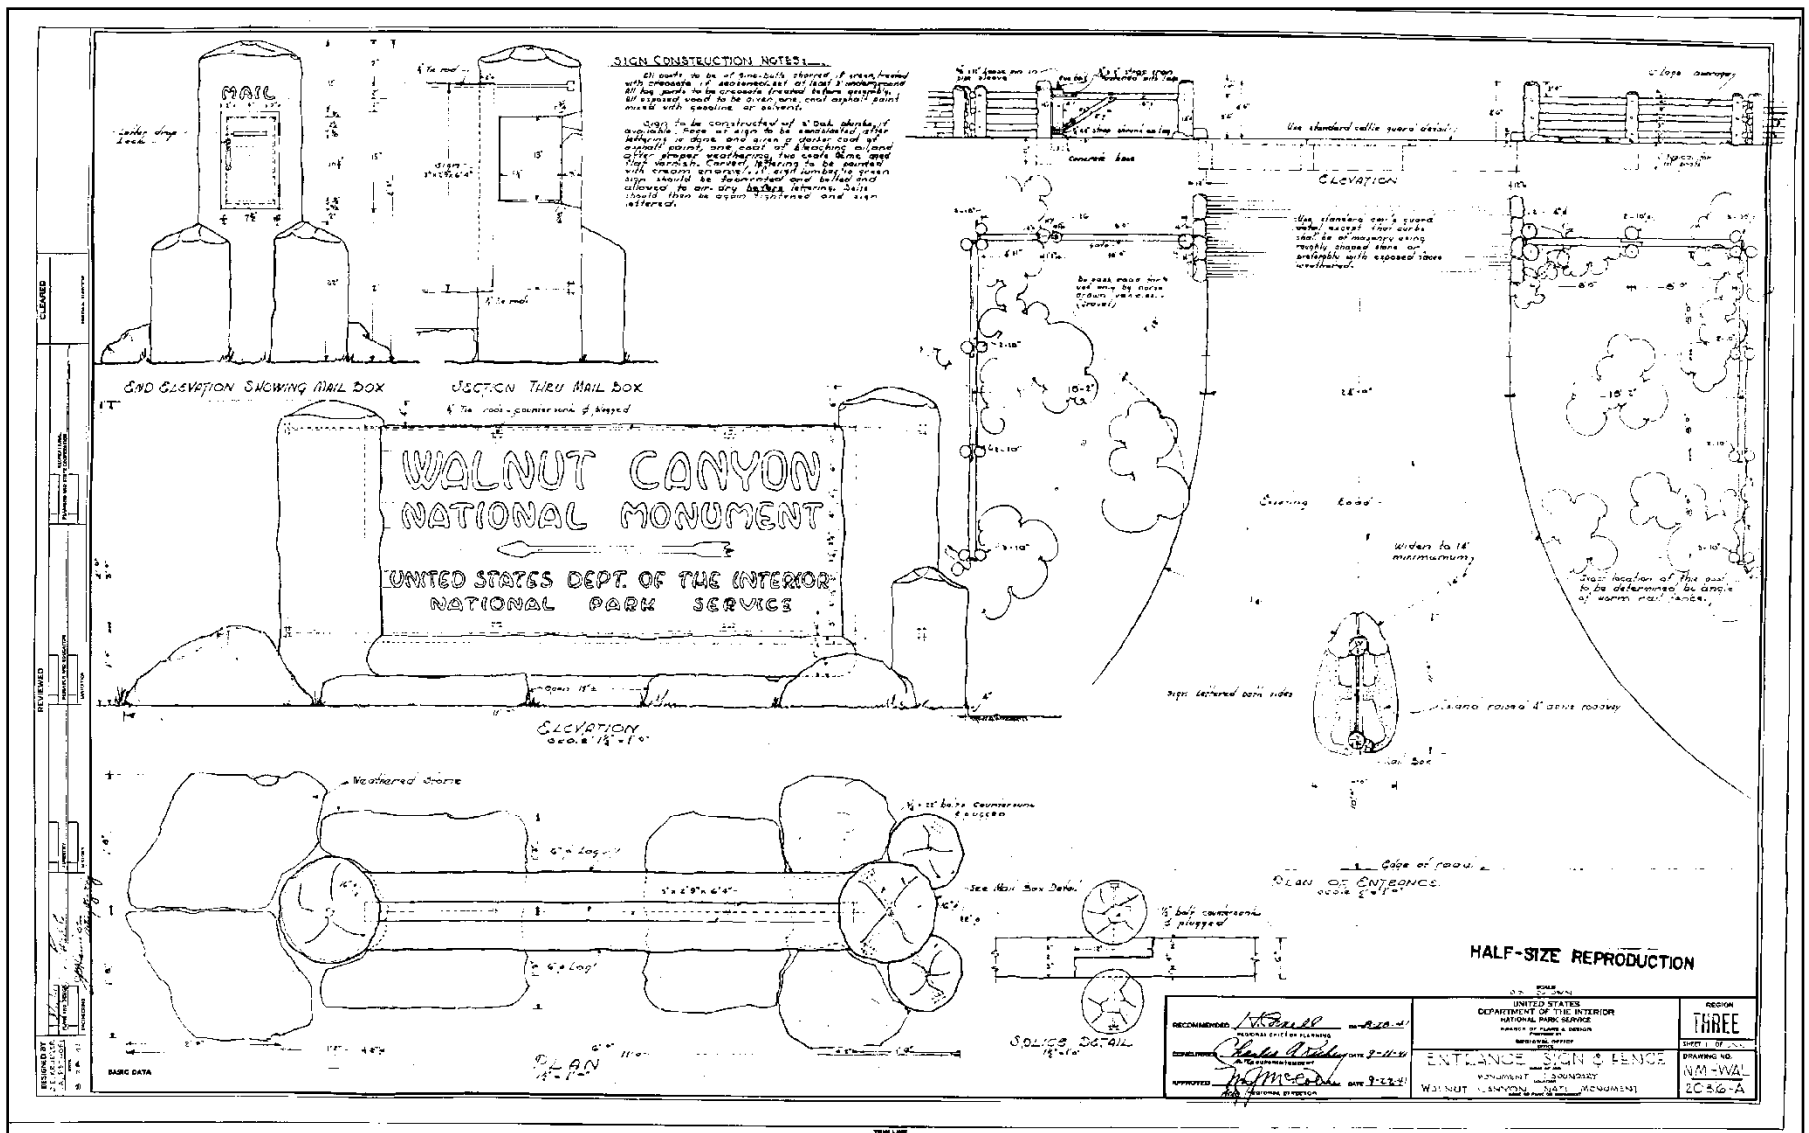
Plans (NPS Dwg NM-WAL 2036A) for Entrance Road-County Road 303 junction, 1941.
